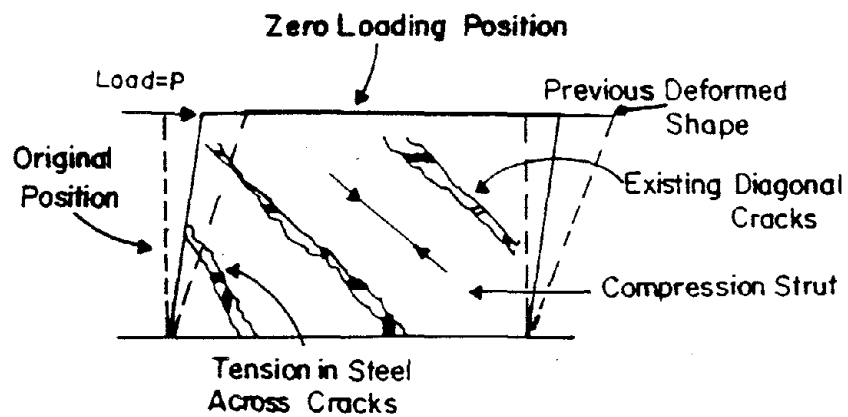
Deformation of an Unloaded Shear Wall Due to Shear
